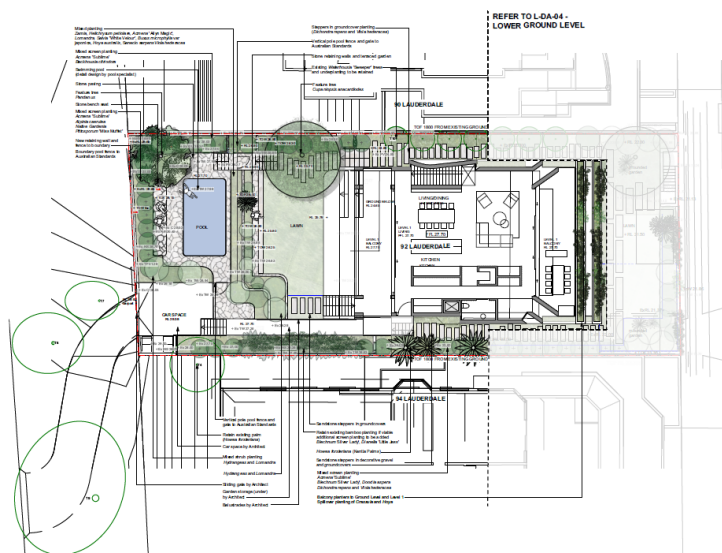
Extract of Ground and Level 1 (Source: 360 Degrees Landscape Architects)
